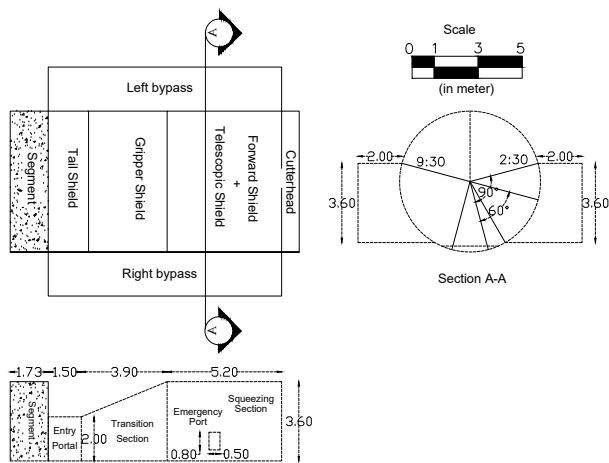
Plan and Cross-section for Right and Left Bypass tunnel
